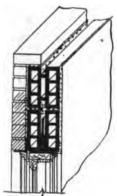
Section of Window Opening of Wide Span, Showing Head Construction. The Tile Span Is Carried on Either a T Iron or on Two Angle Irons Set Back to Back
